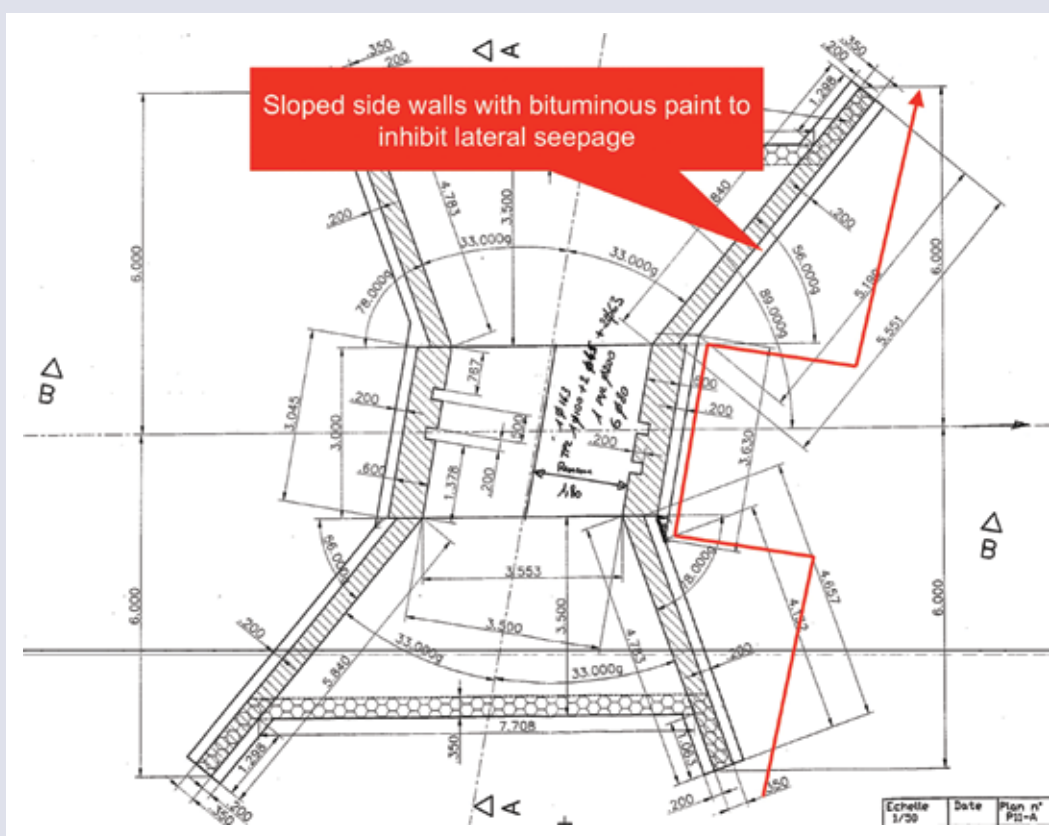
Plan view showing closure gate interface details, Aramon Levee, South of France (courtesy Thibaut Mallet)
